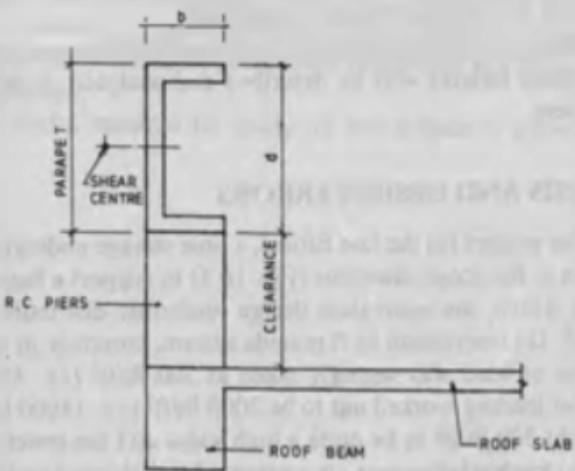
Channel shape of parapet over roof of a cinema building.
